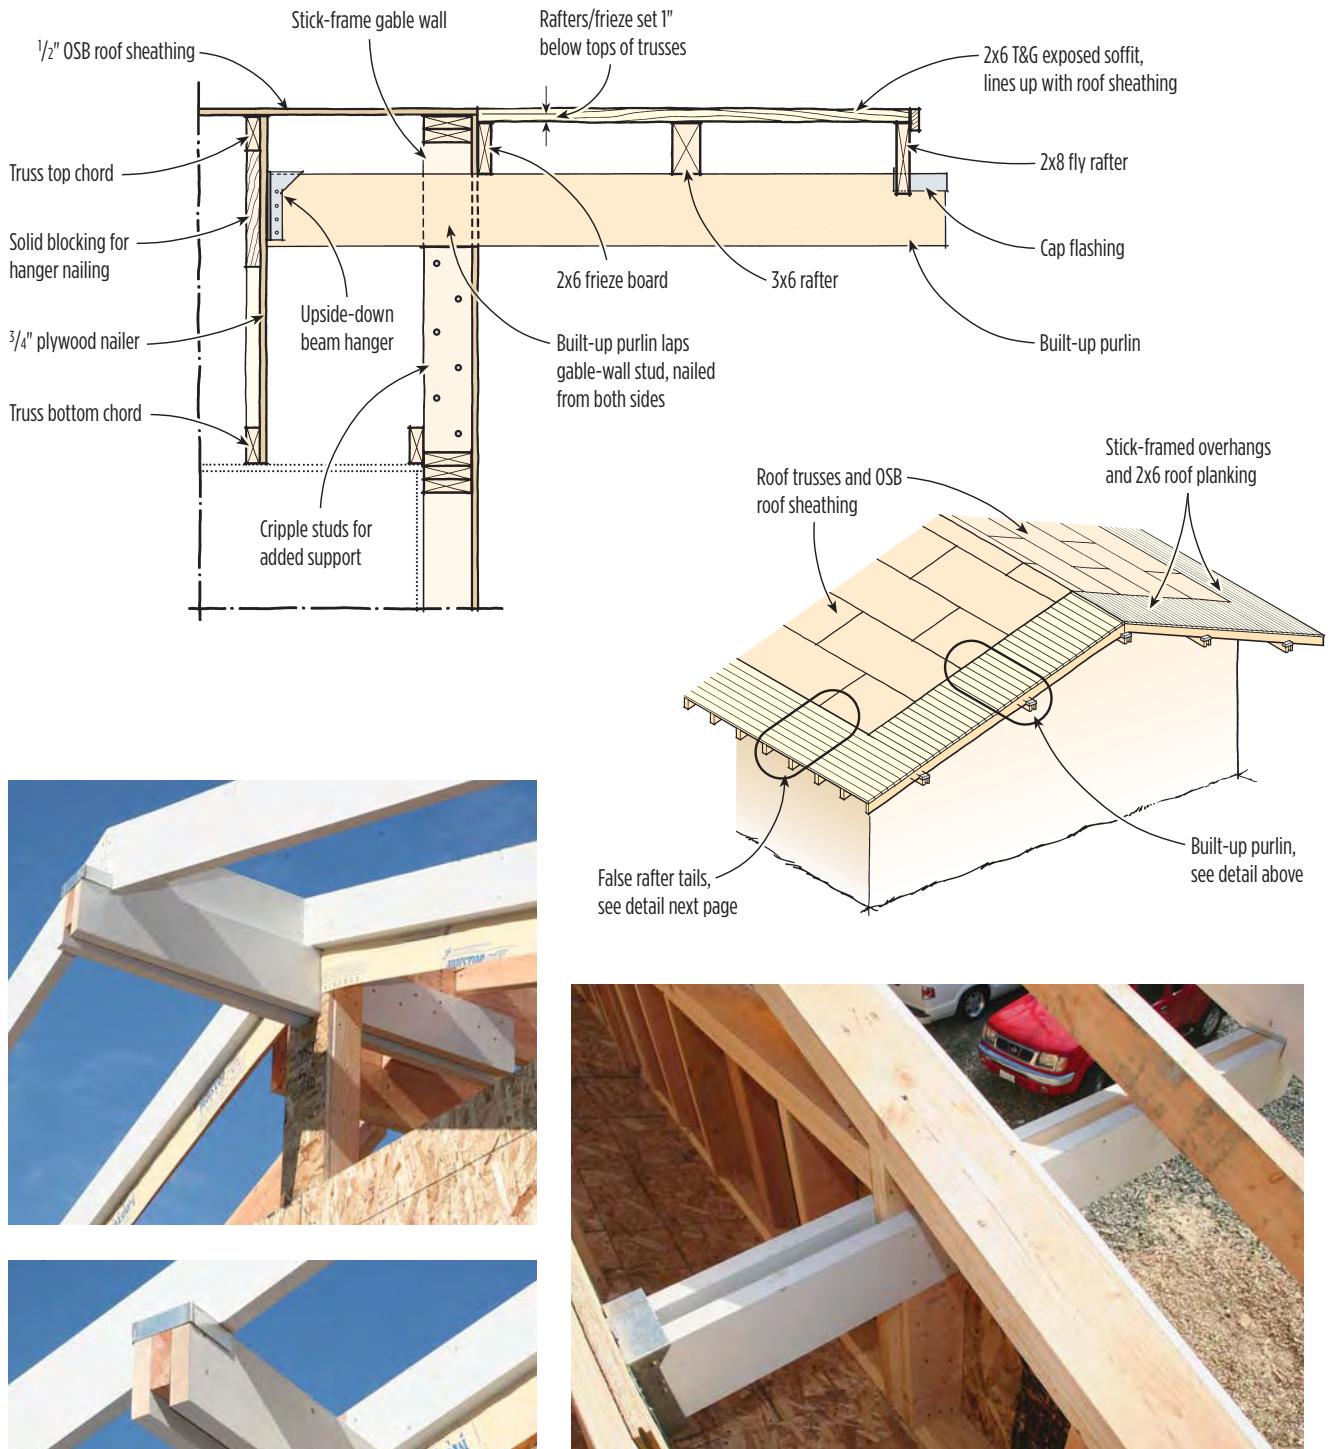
Triple 2-by members passing through the stick-framed gable walls form the 4-foot support purlins for the deep overhangs. An upside-down beam hanger secured to solid framing on the inside (above) helps resist rotation forces, and a cap flashing protects the exposed horizontal surface at the top end of each purlin.
